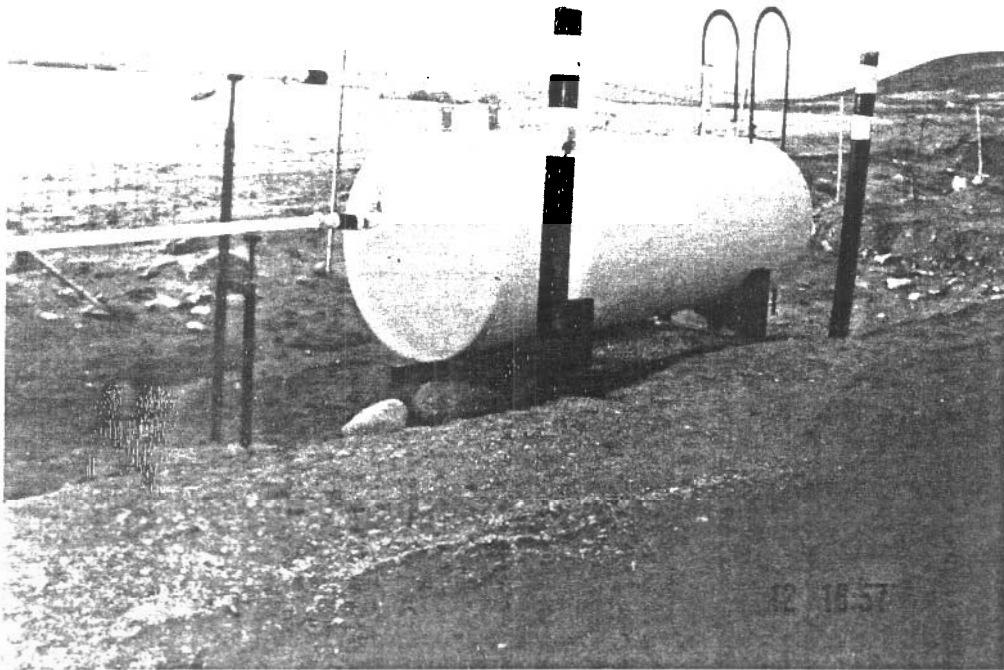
Fuel storage tank at potable water reservoir; no secondary spill protection provided.
